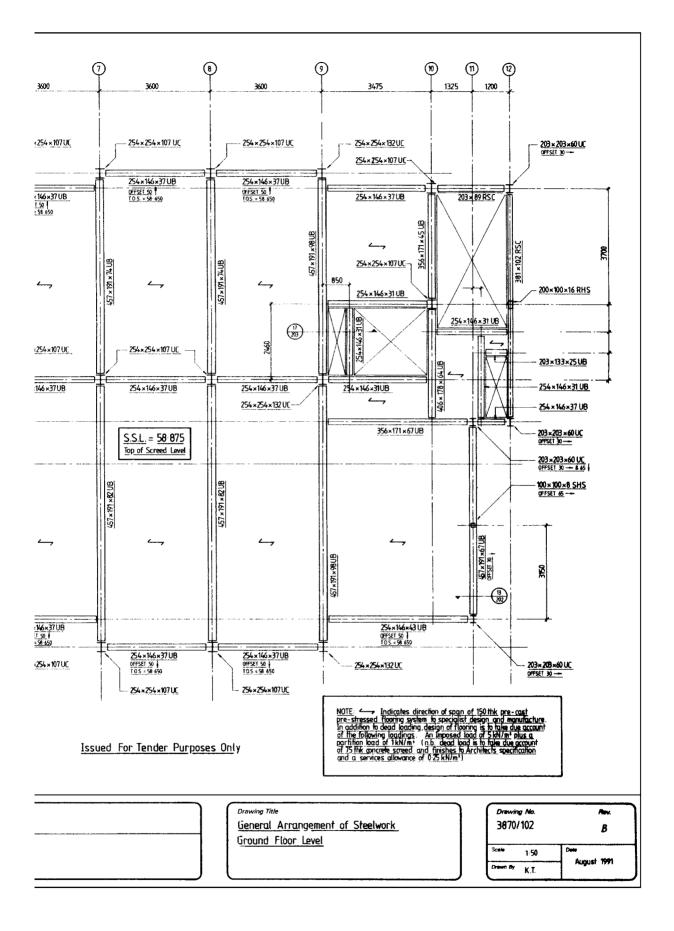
General arrangement of steelwork—ground floor level
